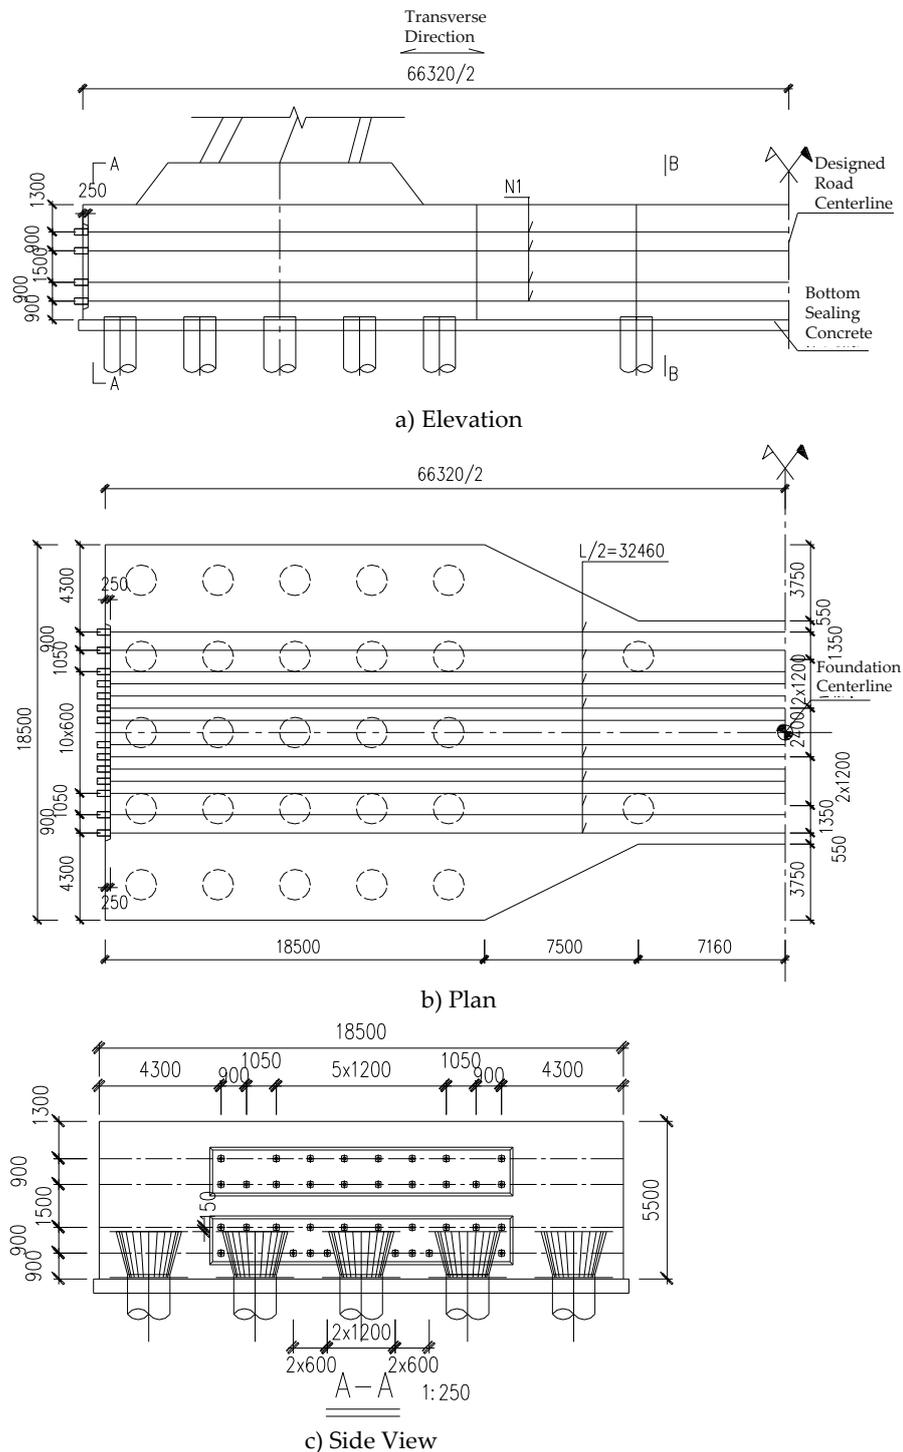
Layout of the prestressed tendons in the pile cap (unit: mm)
